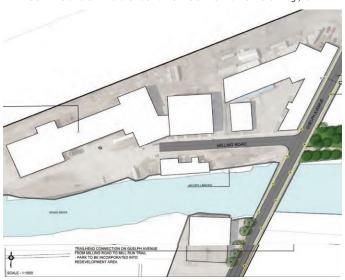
Milling Road existing conditions diagram from the Hespeler Village Streetscape Plan & Urban Design Guidelines
